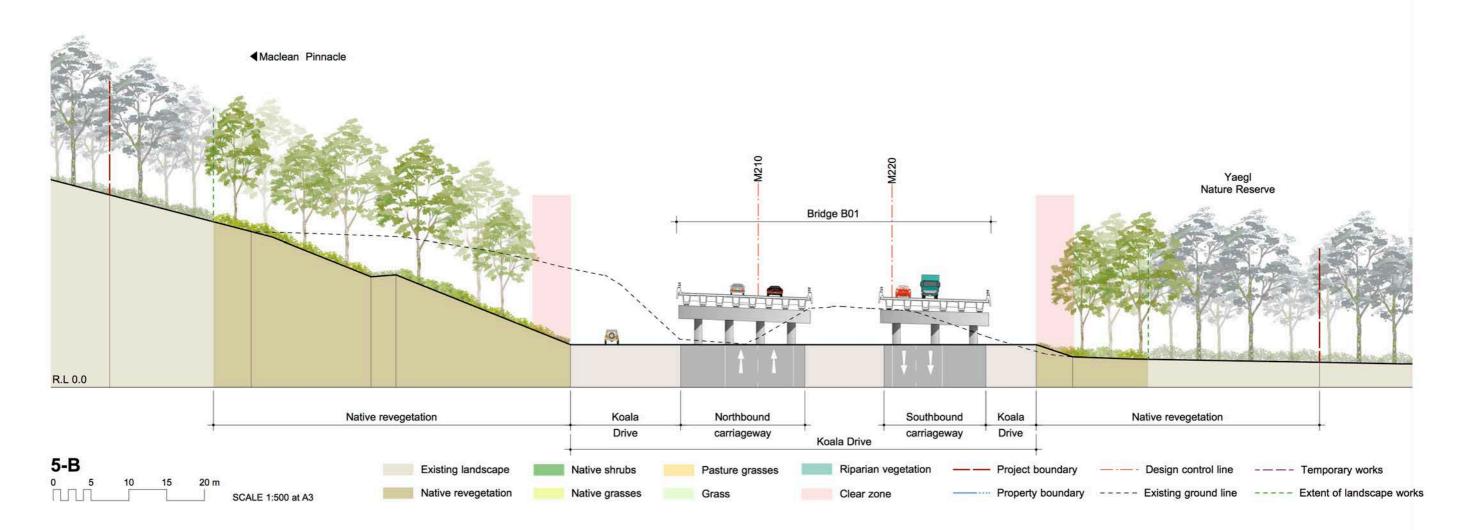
Section 5-B at Bridge B01 – Twin Bridges over Koala Drive
